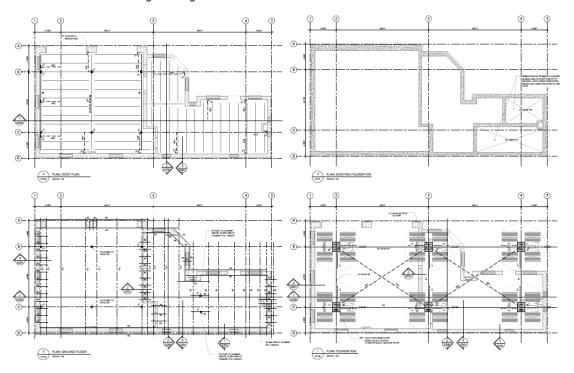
Revised set of plans illustrating the placement of beams and the pinning required to stabilize the Service Station. Source Cleland Jardine Engineering Ltd. 2023
